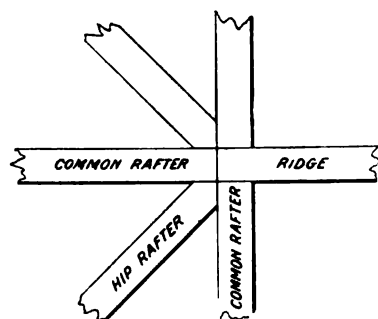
Method of Placing Common Rafter Against Ridge.
